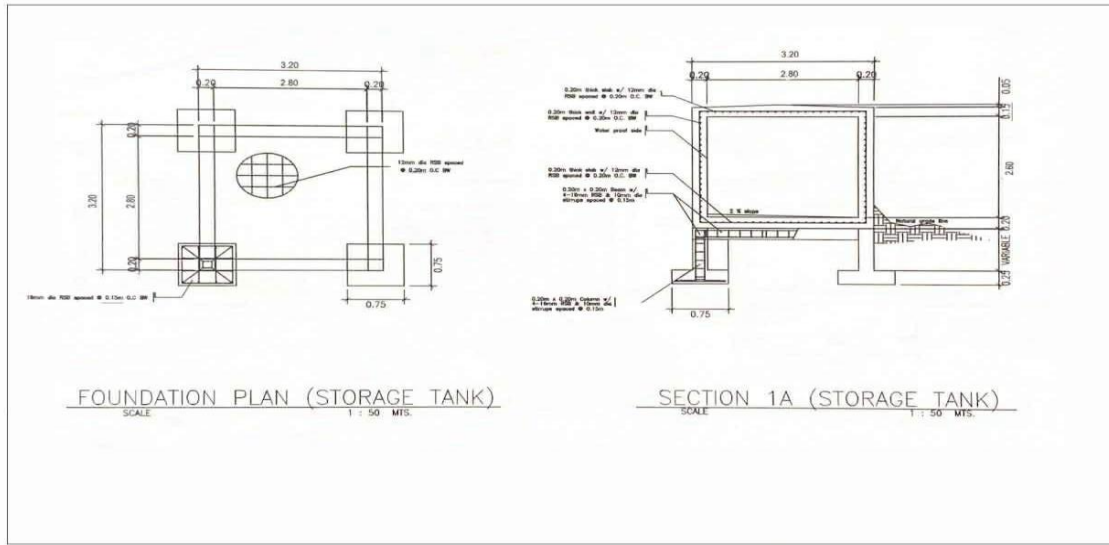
Ground Level Plan and Front Elevation of the SWIS Storage Tank
